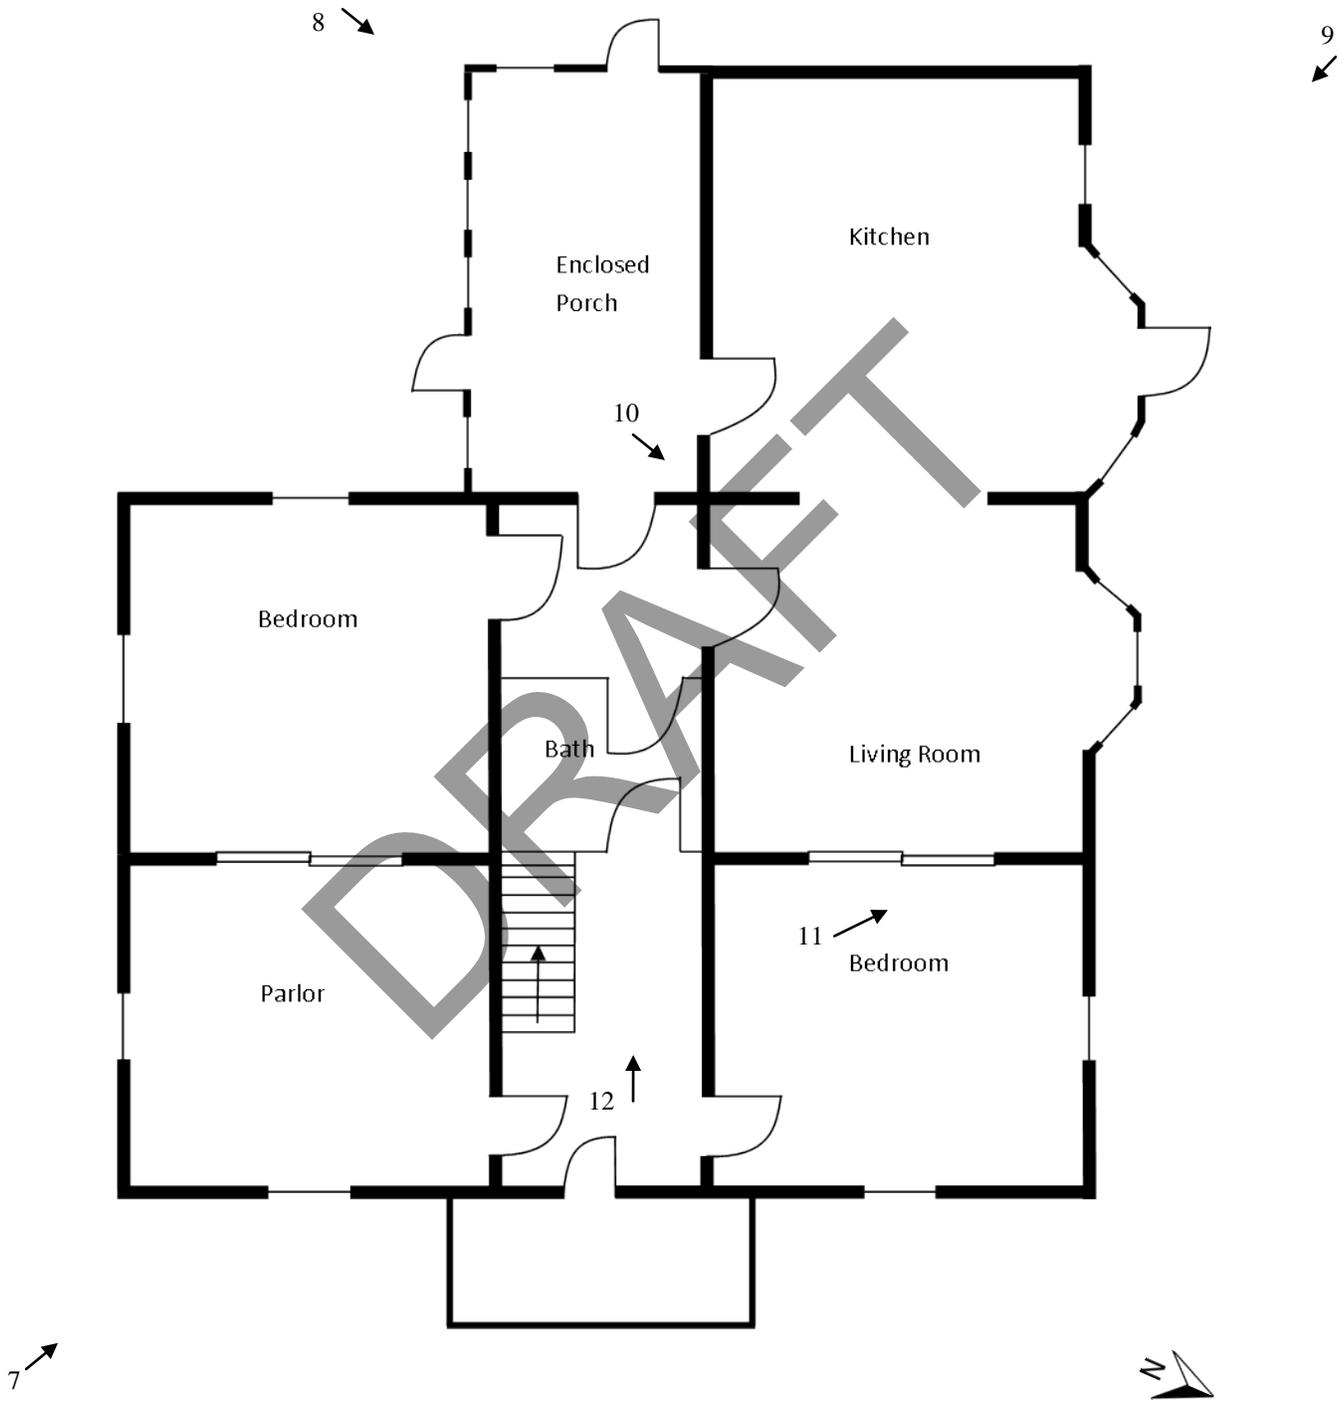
First floorplan sketch of the farmhouse with photo notations 7-12, 2015. Not to scale.
